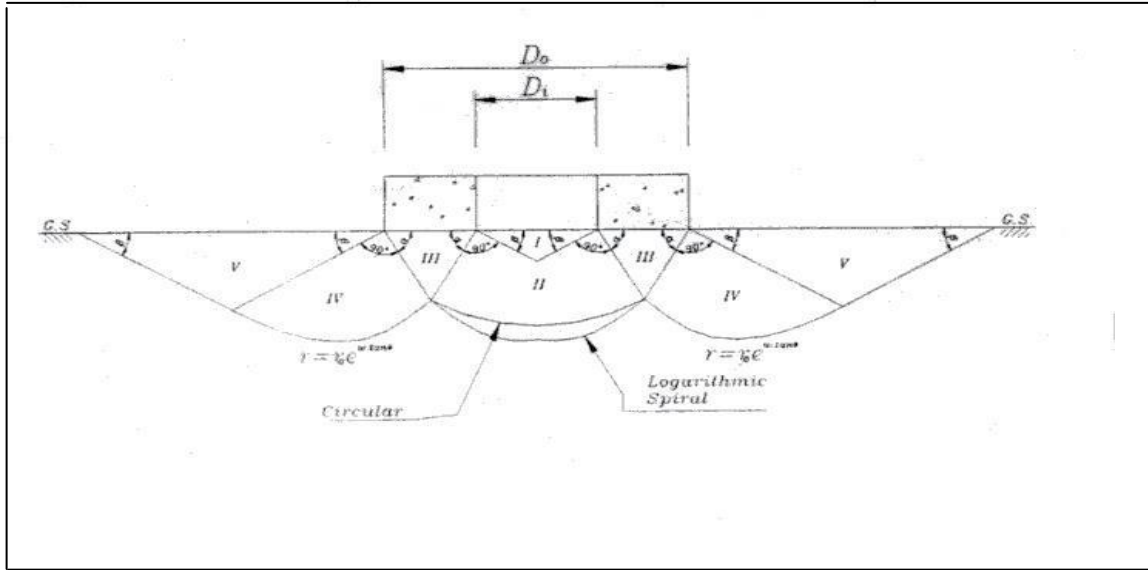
Idealized failure mechanism under ring footing [after Hataf & Razavi, (9)]
